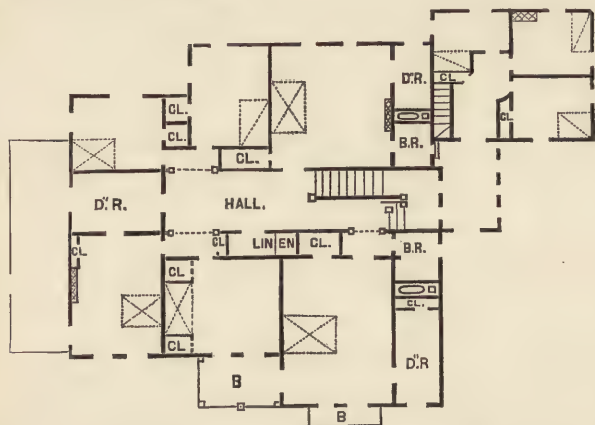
Plan of Second Story—Scale, 30 feet to the inch. B—Balcony; B R—Bath-room—C L—Closet; D R—Dressing-room.
